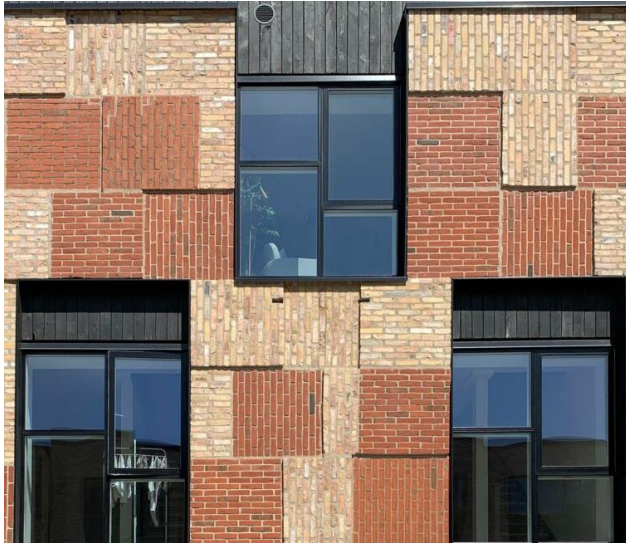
Reclaimed brick used for the new building creating contrasting patterns on the external wall-Image: Architects Journal
